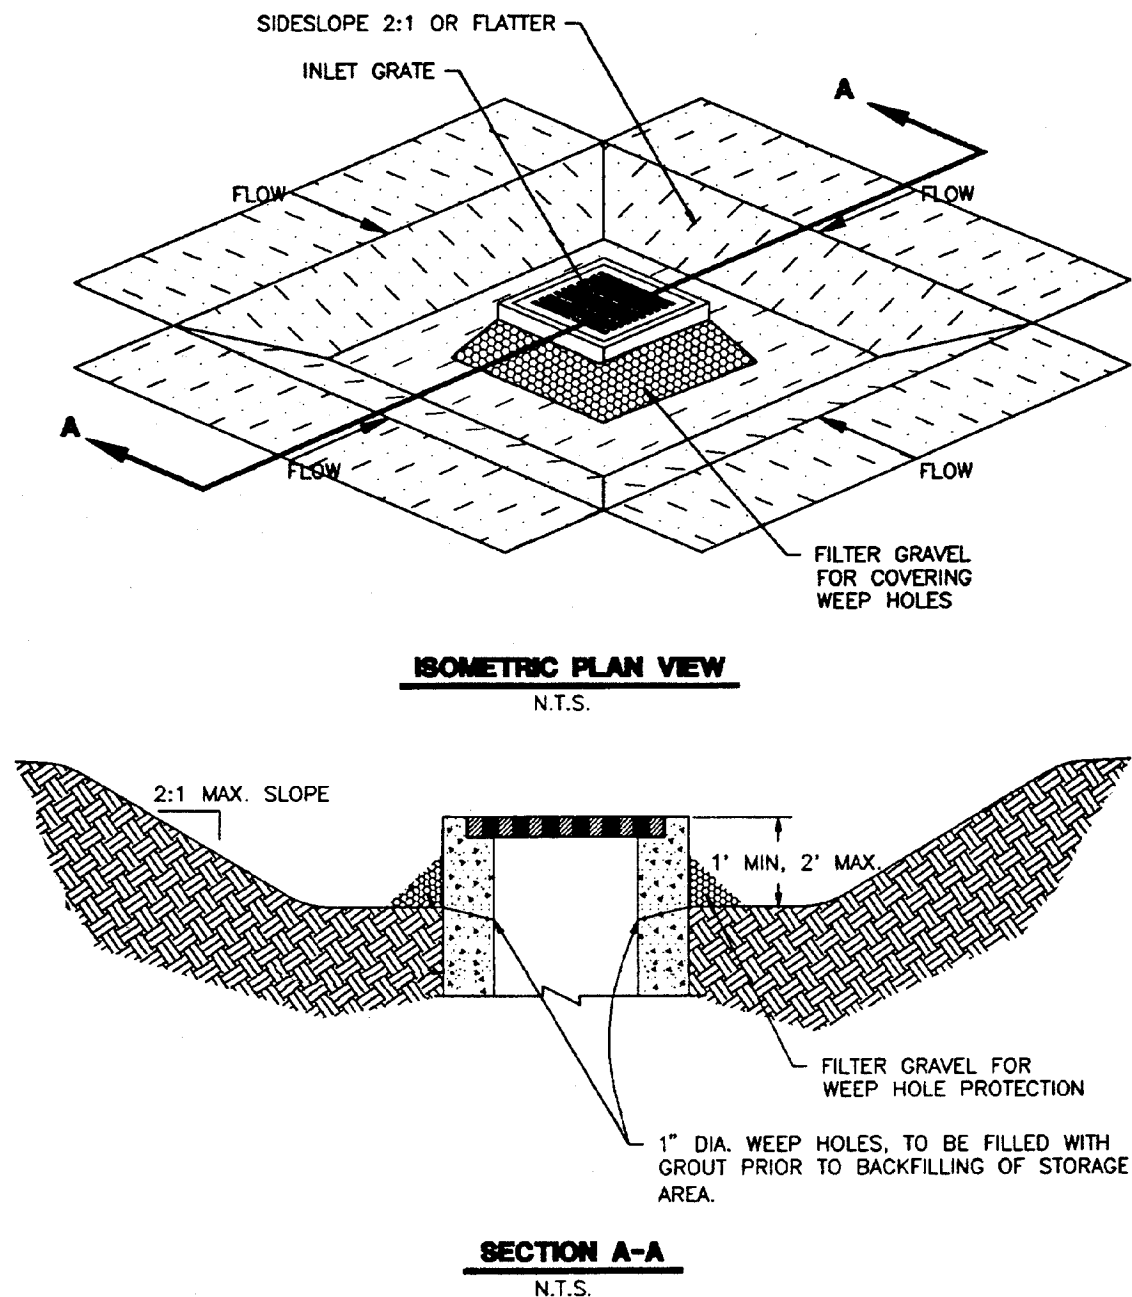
Excavated Inlet Protection (NCTCOG, 1993)
